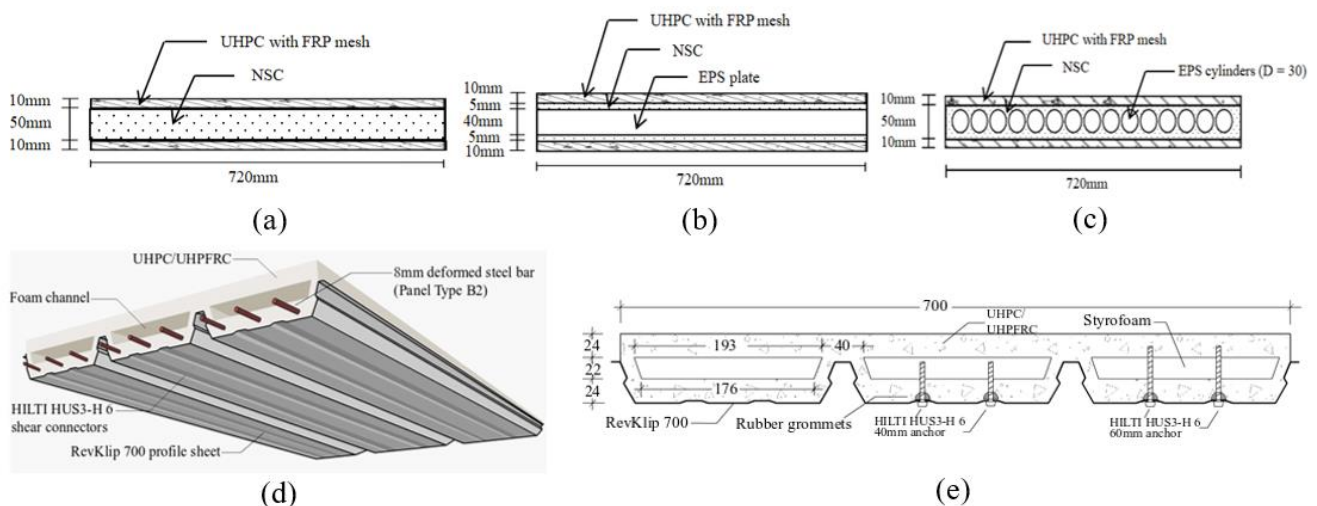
Slab configurations: a) AI section arrangement; b) AII section arrangement; c) AIII section arrangement; d) Type B panel arrangement; and (e) Type B section arrangement.
